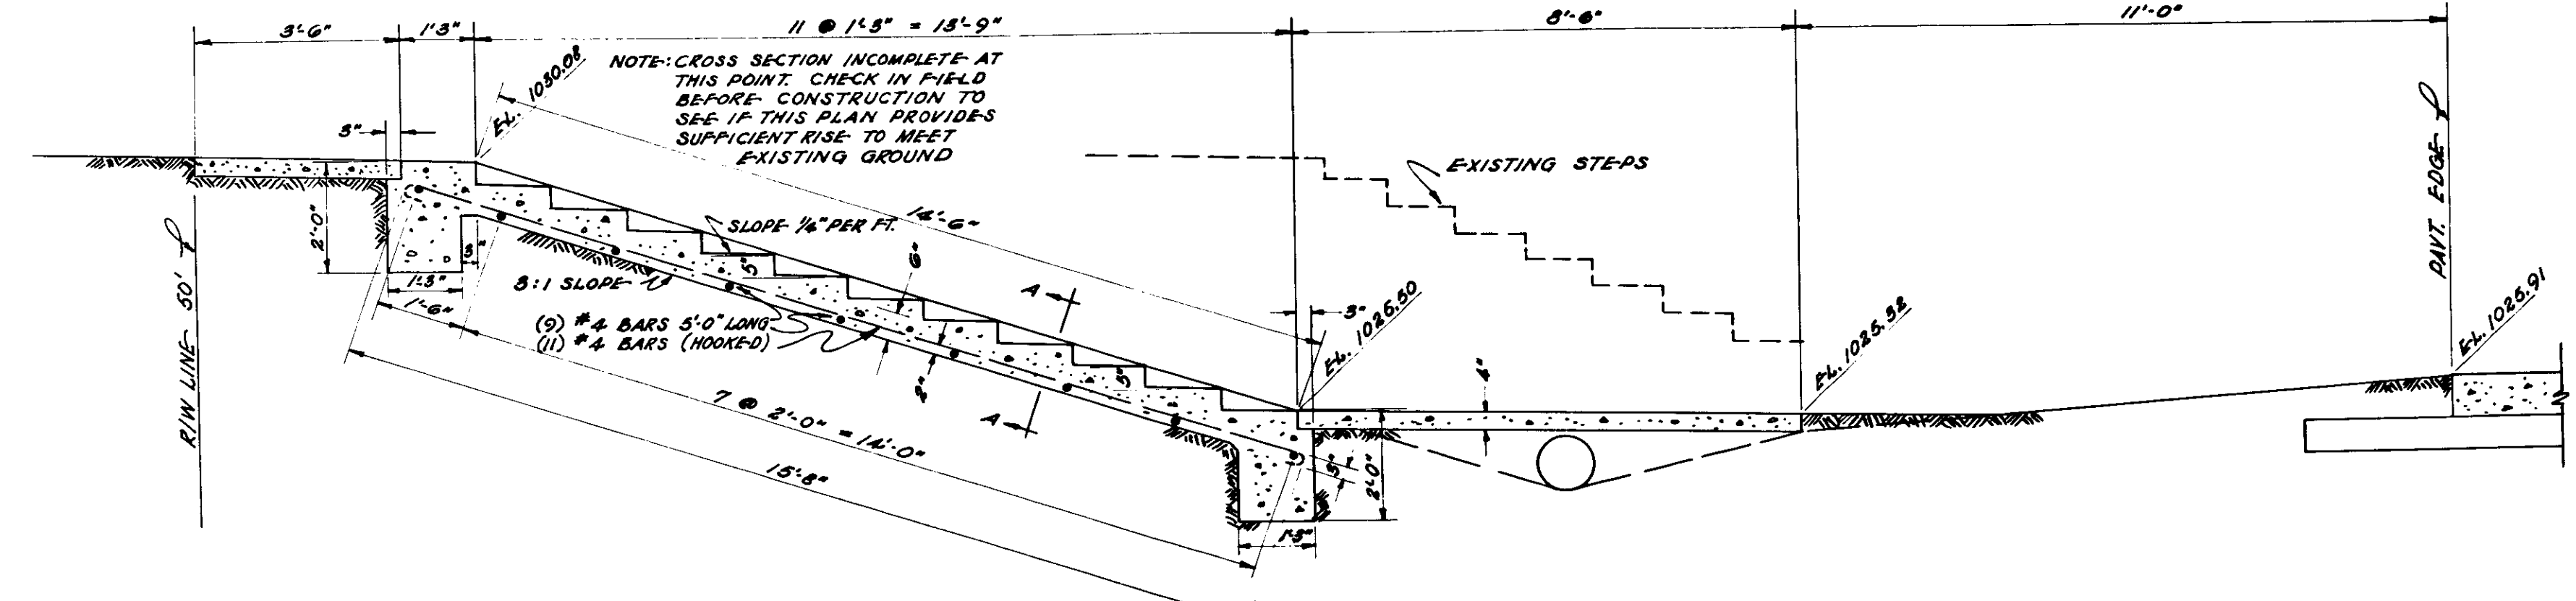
DETAIL OF CONCRETE STEPS LT. STA. 569+24
